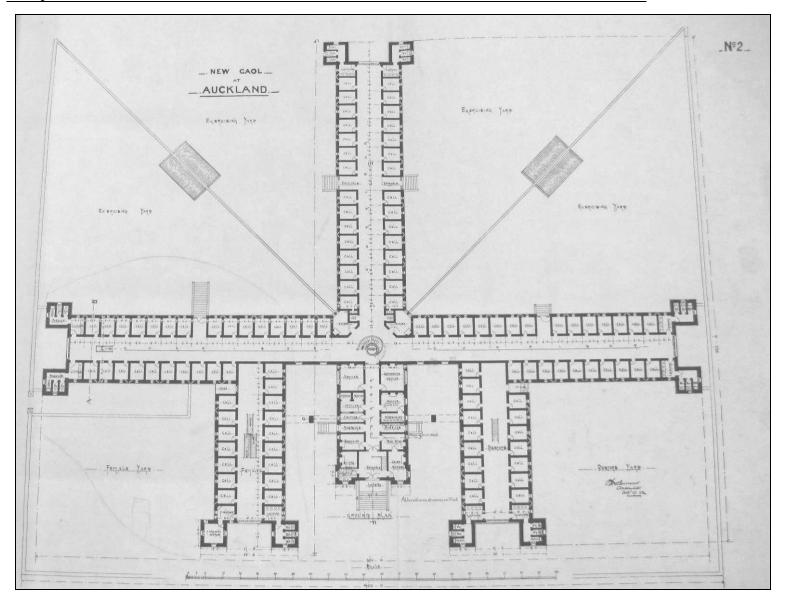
Ground floor plan of Burrows' Prison (Archives NZ)
